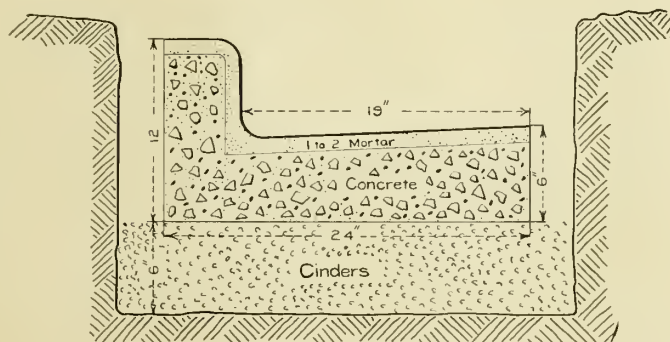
Cross Section of Combined Concrete Curb and Gutter
